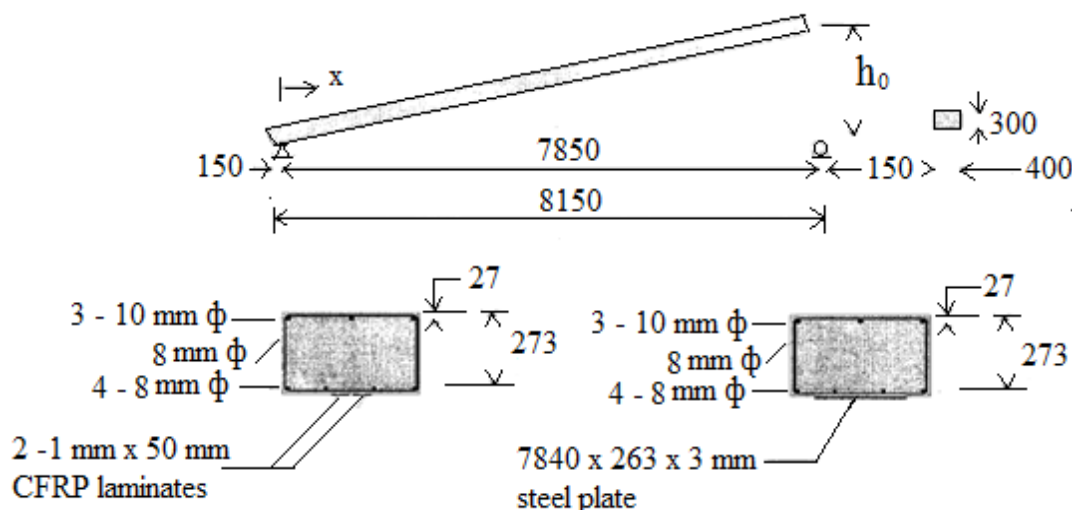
(a) Test setup; (b) RC beams strengthened with CFRP laminates and (c) RC beams strengthened with a steel plate (Erki & Meier, 1999).
